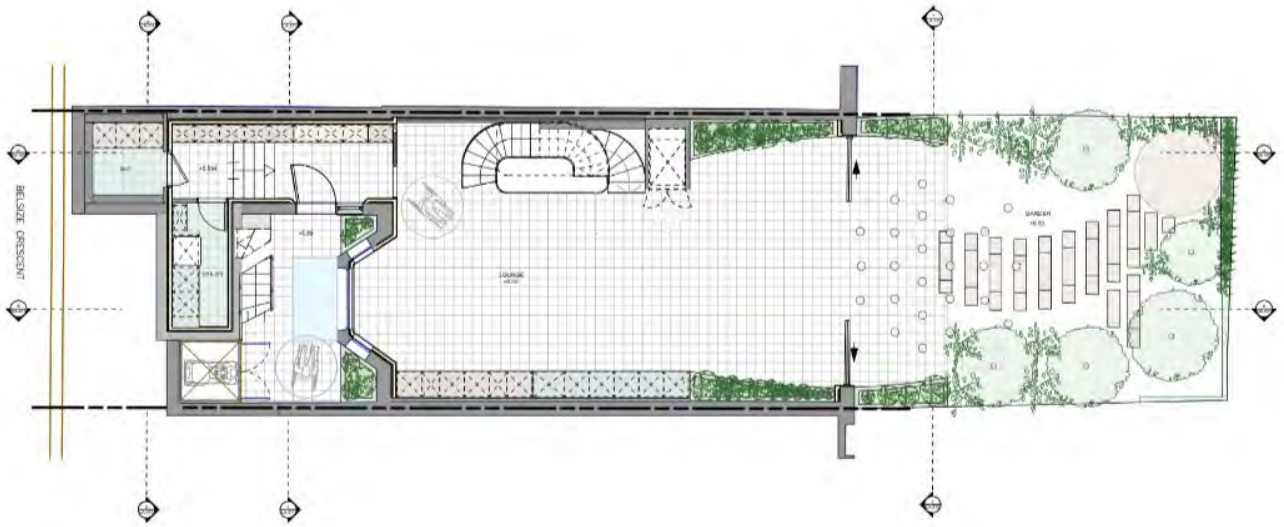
Plan view of the proposed Lower Ground Floor with the garden space
